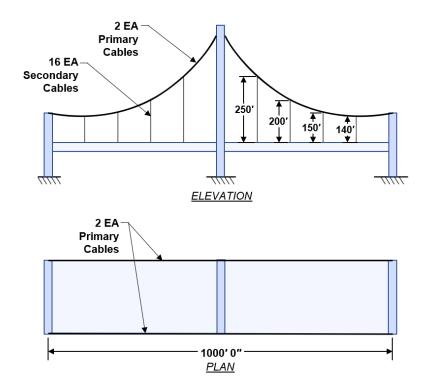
Elevation and Plan View for Suspension Bridge Example
